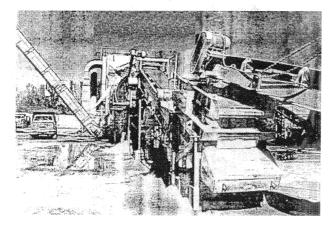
Single-deck scalping screen on drum-mix plant.
